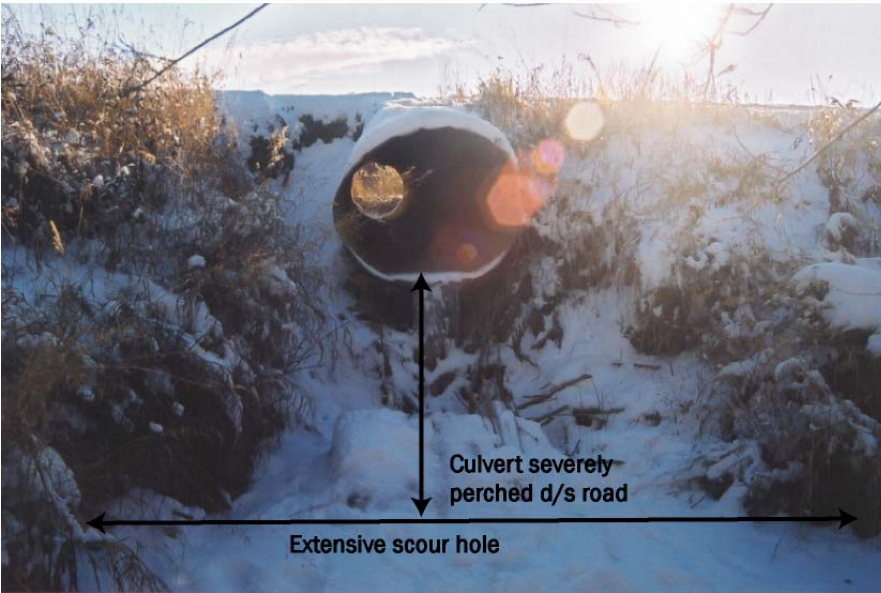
View of culvert outlet downstream of road. Note that the culvert is severely perched and that there is a wide scour hole (November 11/2002).
